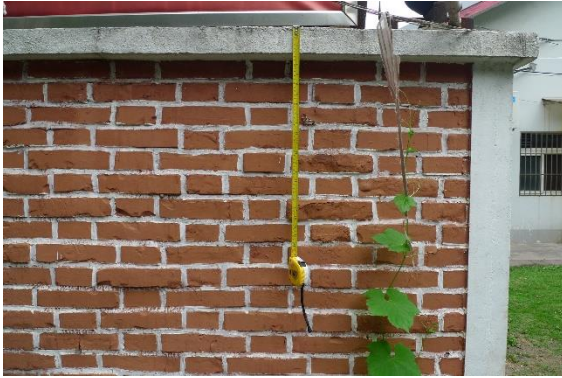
The East Surface of West Wall of the Pool Room, 2014
